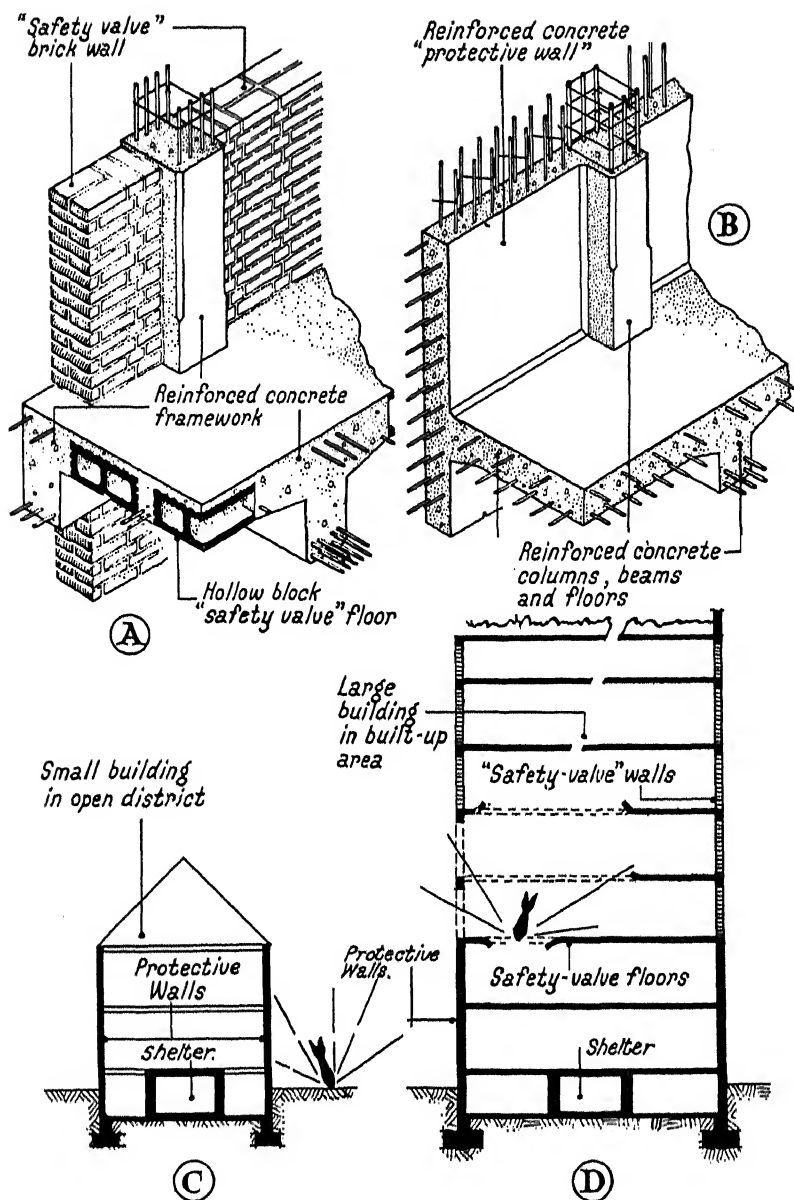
Framed buildings showing effect of "safety valve" walls and "protective" walls.
